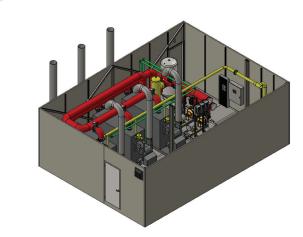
Isometric view of a three (3) 3,000 MBH boiler modular plant.
